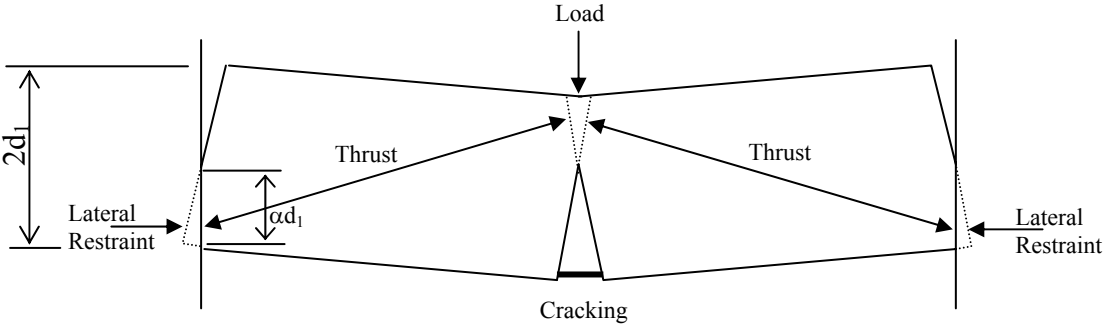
Arching Action in Reinforced Concrete Slab Strip (Rankin and Long 1997)
